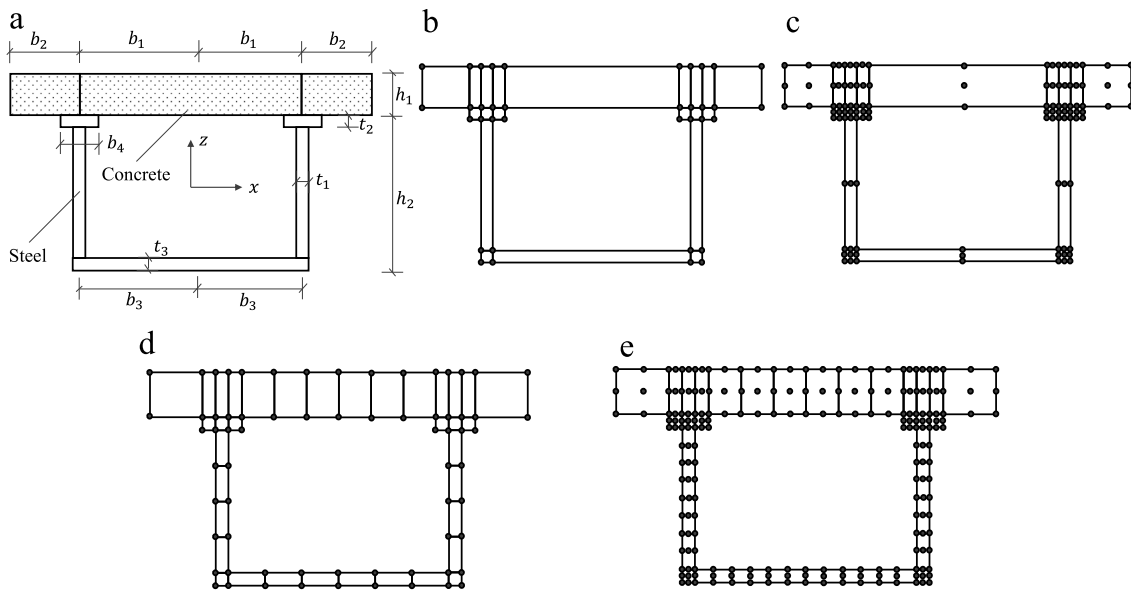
Box-girder cross-section and LE discretizations. (a) Box-girder cross-section; (b) 20L4; (c) 20L9; (d) 36L4; (e) 36L9.
